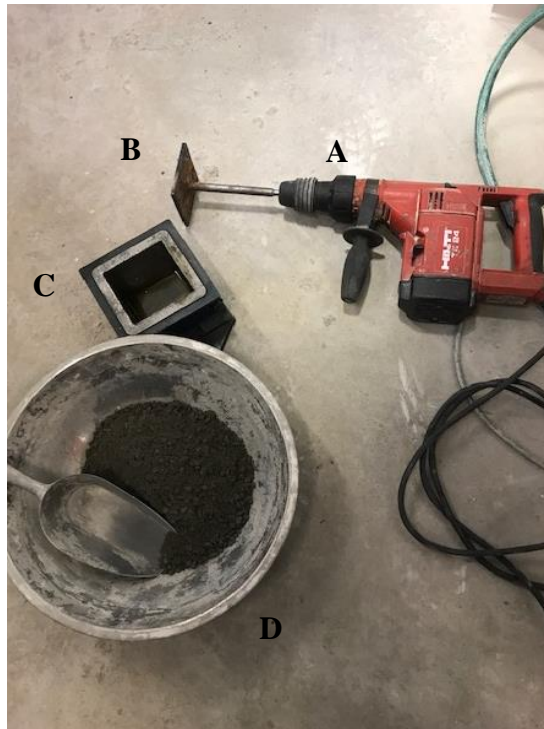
Image showing A. the percussion drill, B. the modified tool bit, C. a steel cube mould and D. the zero-slump concrete used
